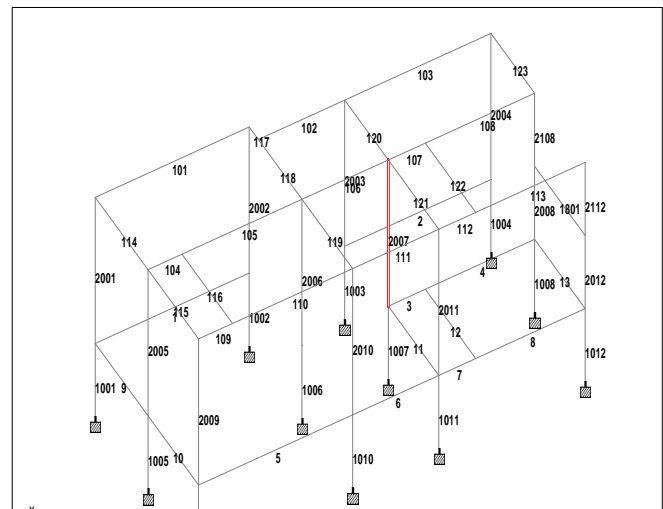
First floor column no 2007 (shortage of reinforcement)
